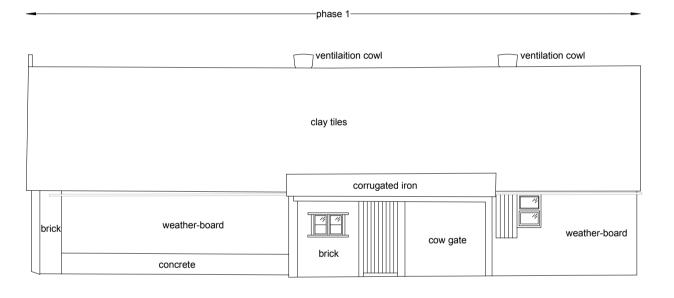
Structure 10, 1898-1918 milking shed west elevation.
